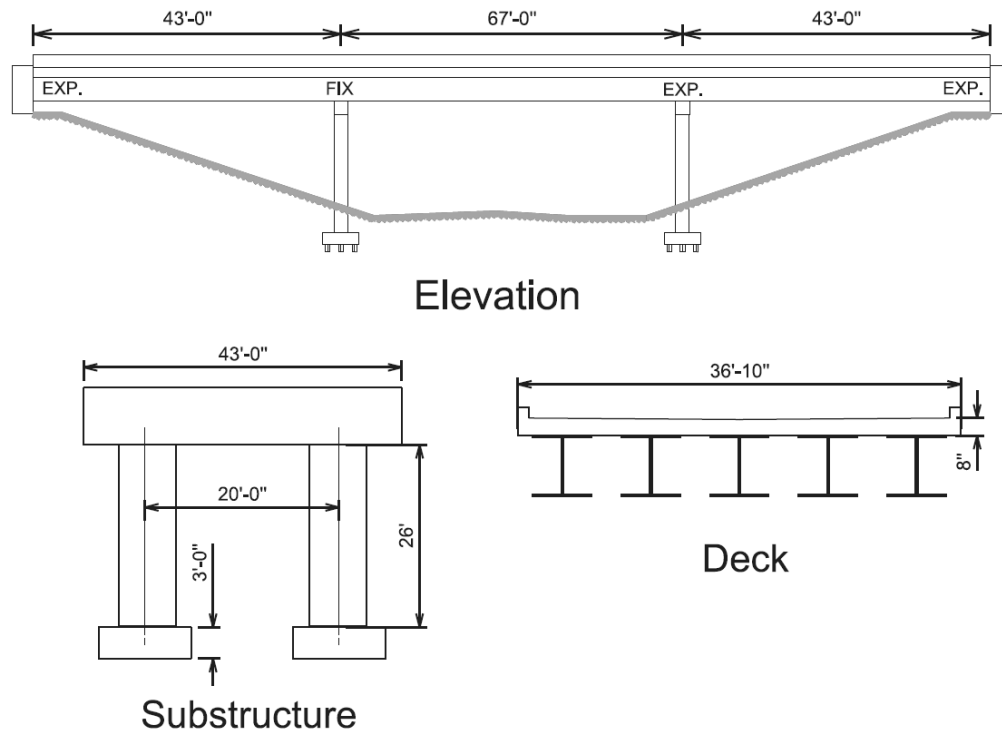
Multi-Span Continuous Steel Girder Bridge Layout.
